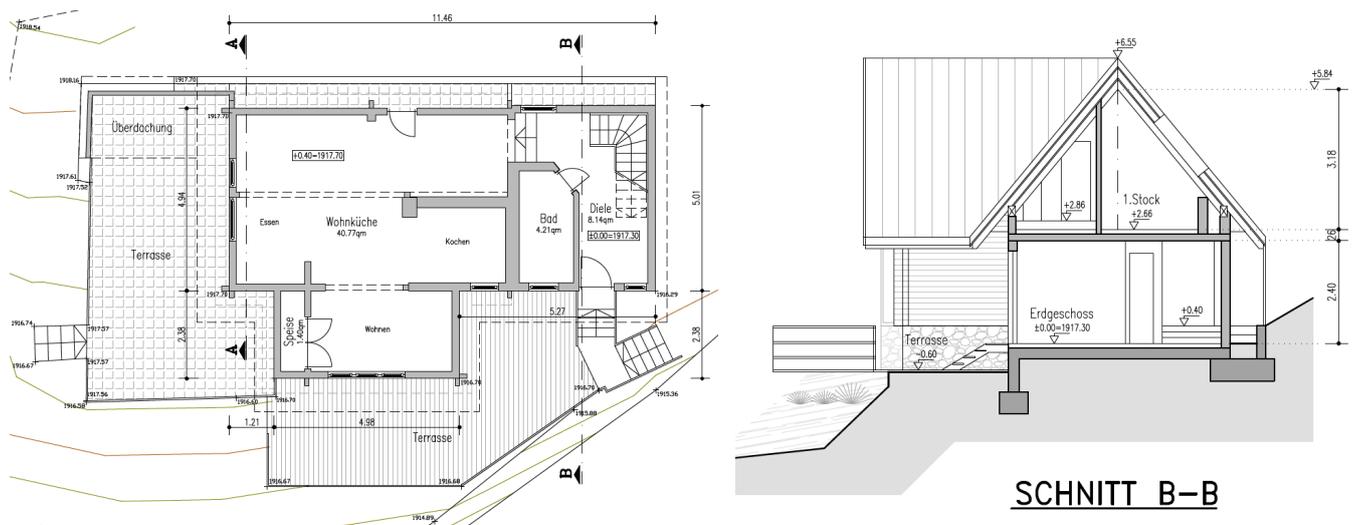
Floor plan and section of the ski lodge (Studio Geoplan).
